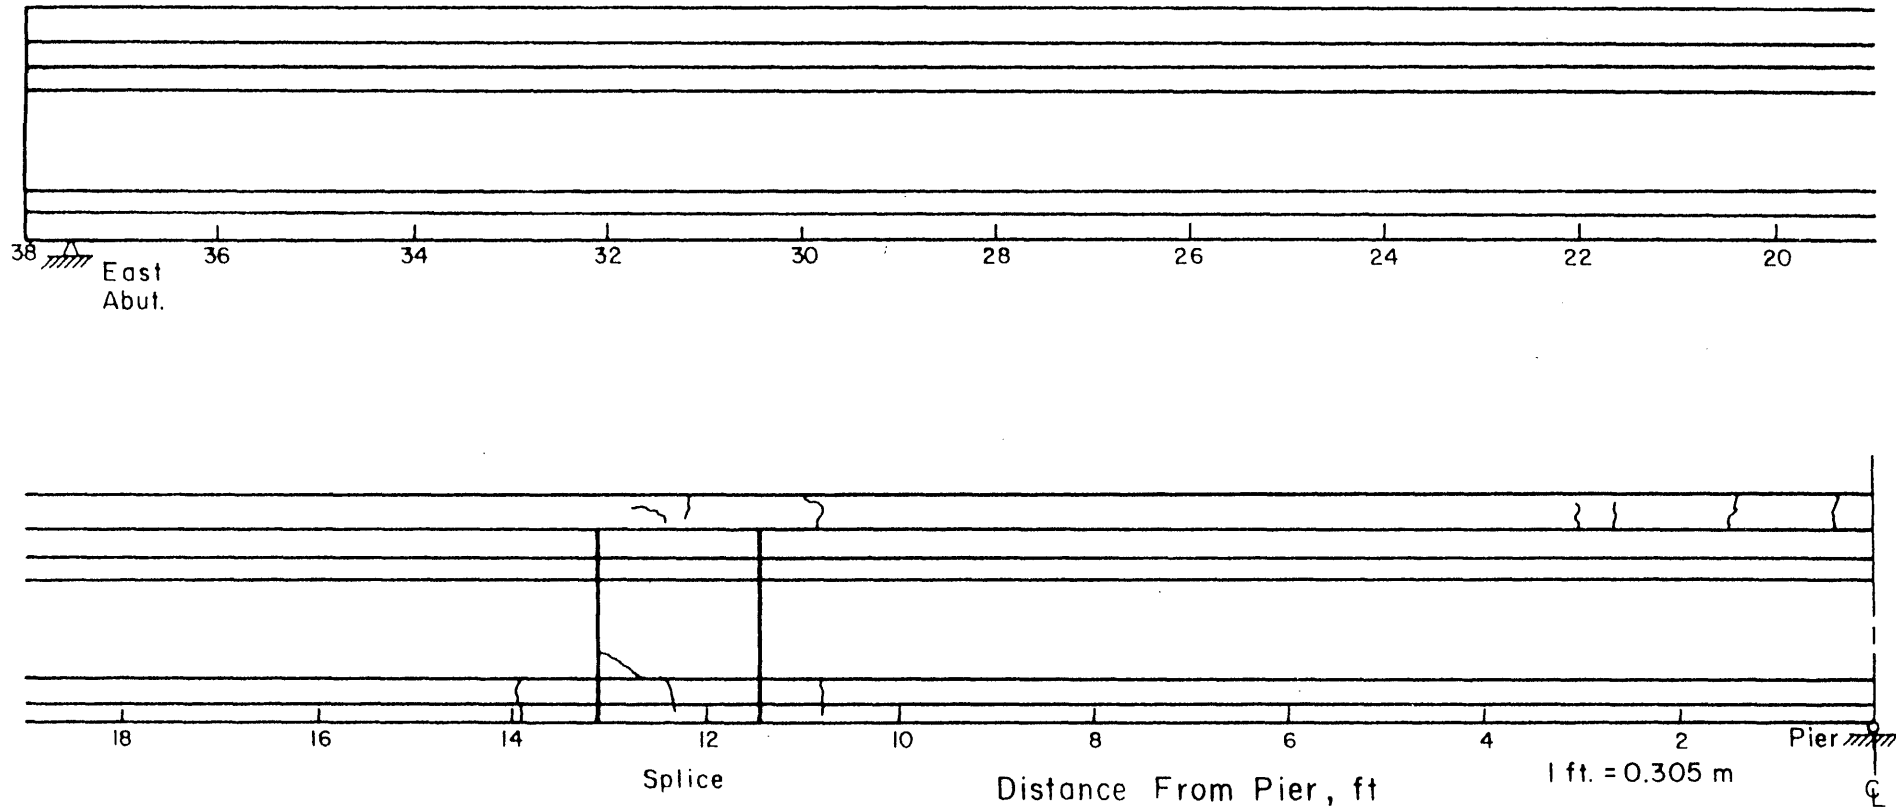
CRACKS IN EAST SPAN OF MODEL 2 DUE TO DEAD LOAD
